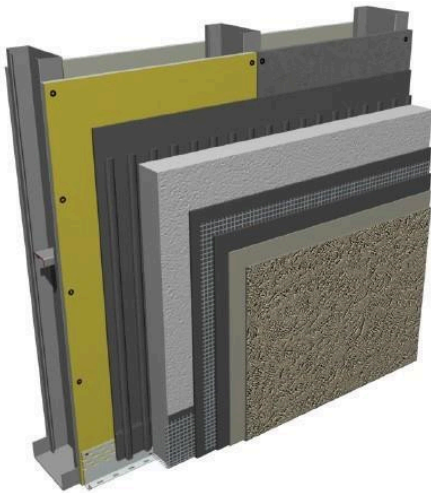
InsulROCK EIFS with moisture barrier over glass-fibre-faced gypsum sheathing and cement board
